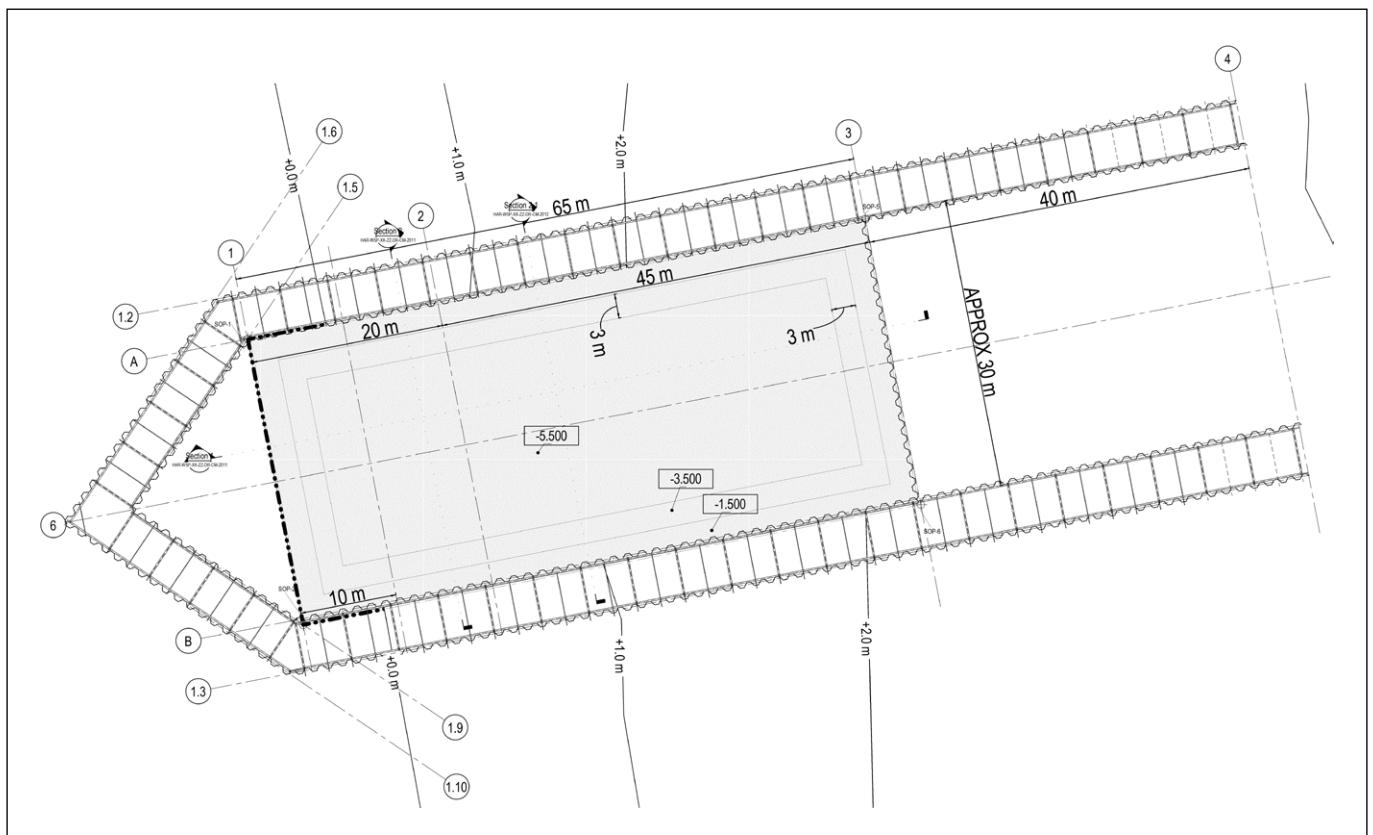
Plan view of the excavation facility (contours are relative to MSL)
